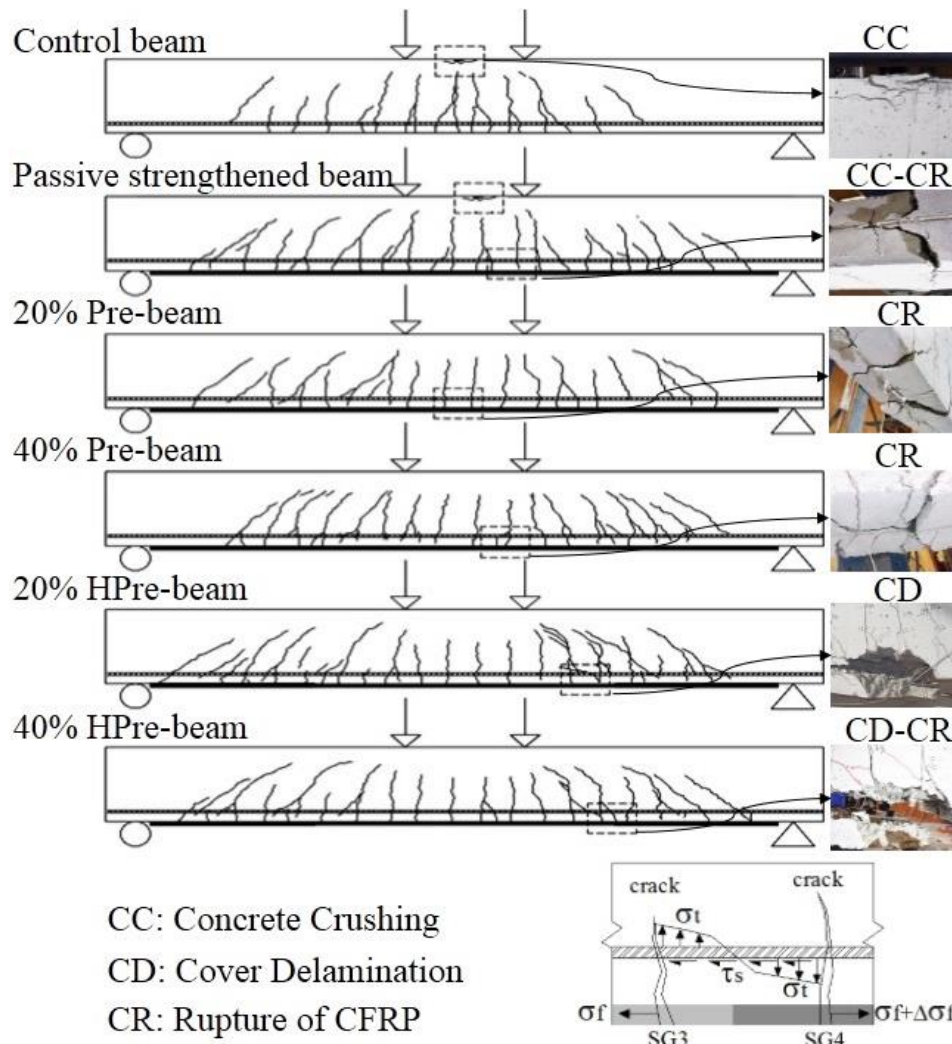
Crack pattern and prevailing failure modes at the ultimate capacity of the tested beams
